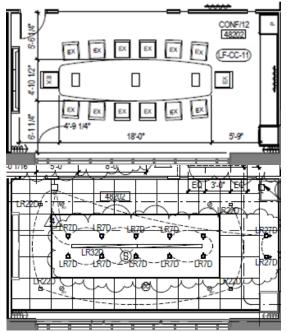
Floor plan and reflected ceiling plan of the Figure 3 videoconference room. LR7D is the LED wallwasher; LR27D is the artwork accent light. © Carson Guest and Newcomb and Boyd.
